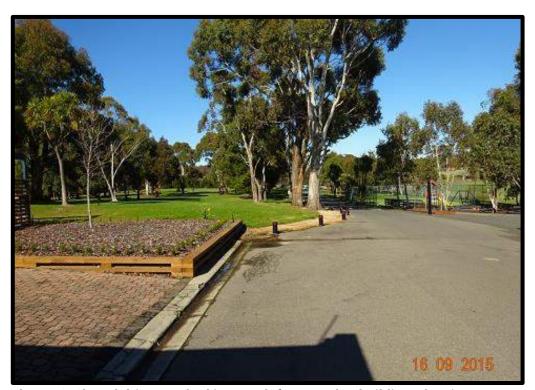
Shared driveway, looking south from market building, showing existing delineated pedestrian footpath on left.
